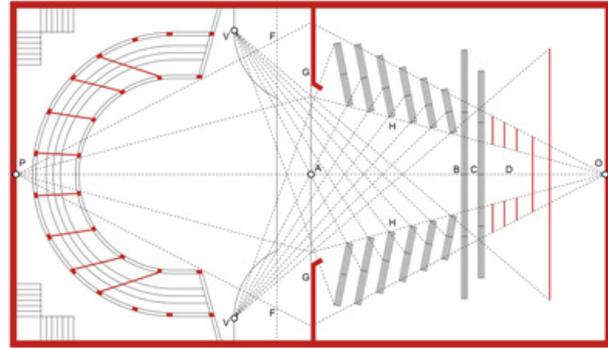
Plan reconstruction of the scenic theater [Pozzo 1693] (drawing by author, 2024).
